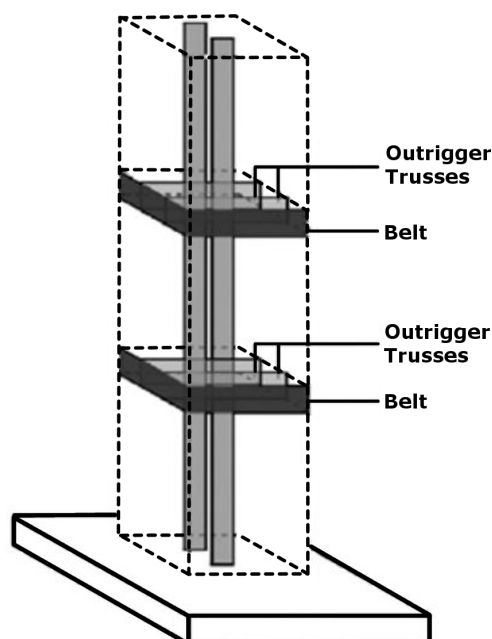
Illustration of the core and outrigger system (Rist,V.C.& Swensson S. 2016)
